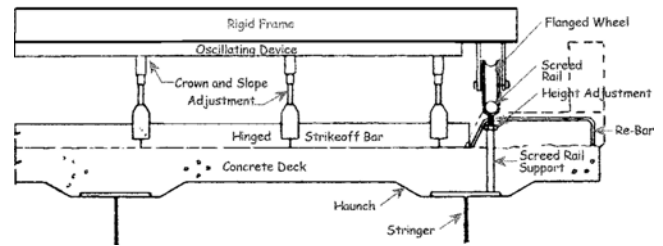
Idealized arrangement of longitudinal travel, transverse finish equipment.
